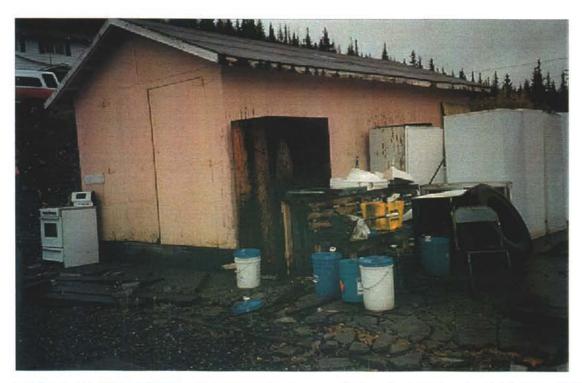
Elsa. Storage shed below mine houses. Note pails full of waste oil. (Building # 52)
